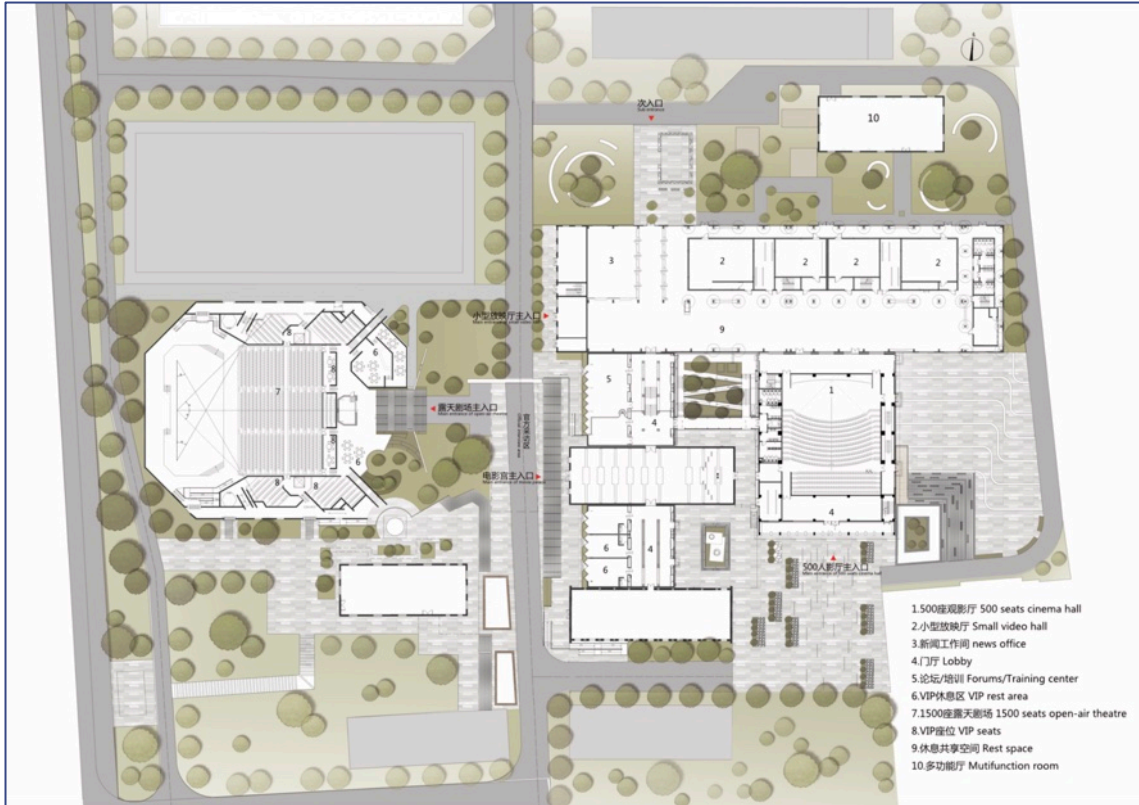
Ground floor plan of Pingyao Film Palace © THAD
